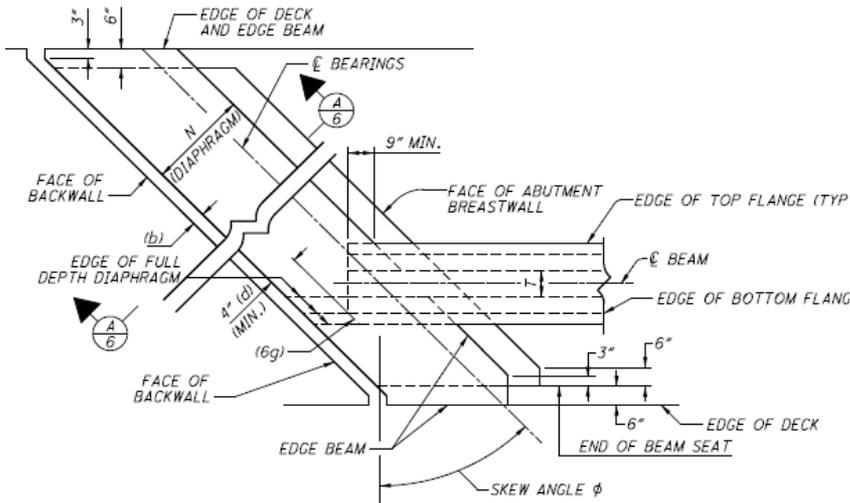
SHALL BE USED AT THE FASCIA BEAM AND ALL INTERIOR BEAMS WHEN THE SKEW ANGLE EXCEEDS 10°.
